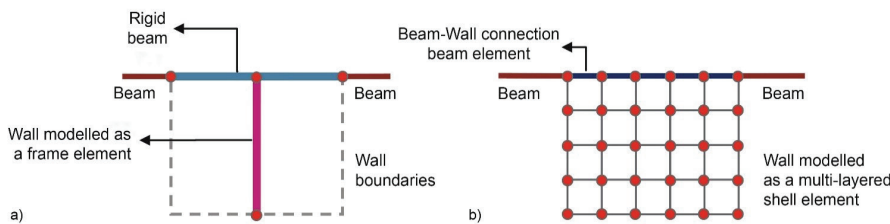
Wall models: a) frame elements system; b) shell element (acc. to Fahjan Y. M. et al. 2010)
